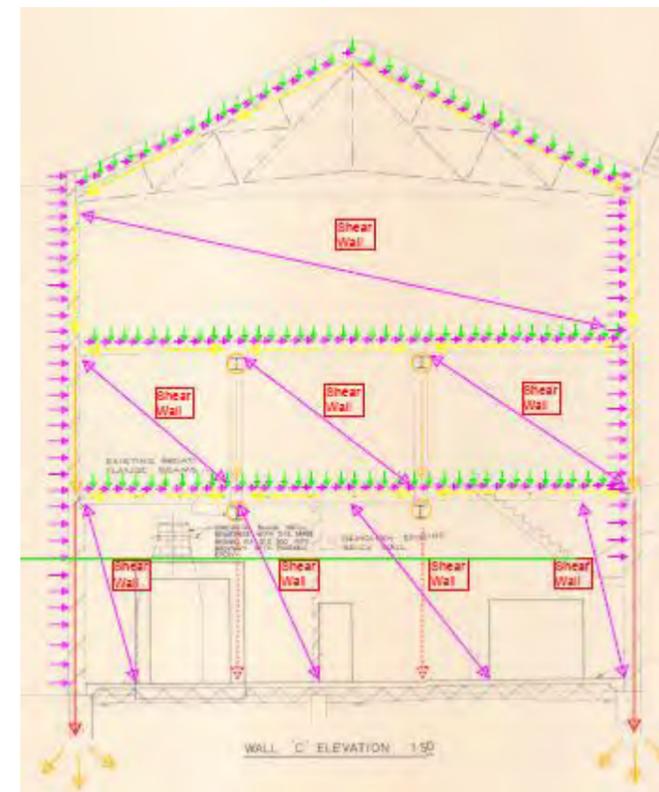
Southland Times Internal cross wall C typical transverse lateral load path
